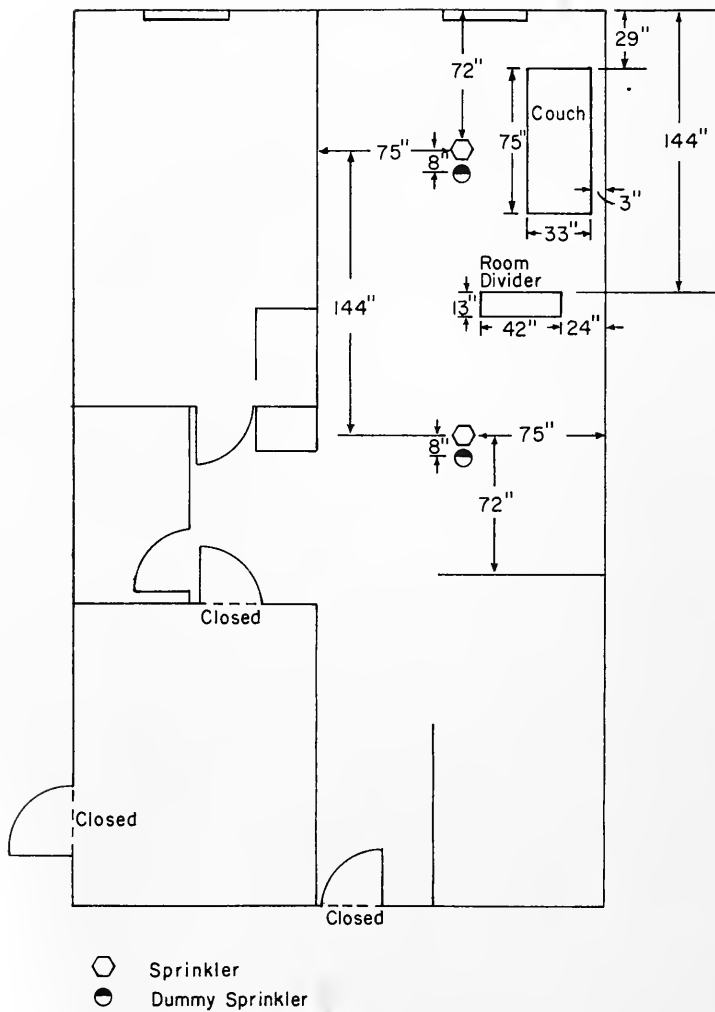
LOCATION OF COUCH AND ROOM DIVIDER IN TEST APARTMENT
